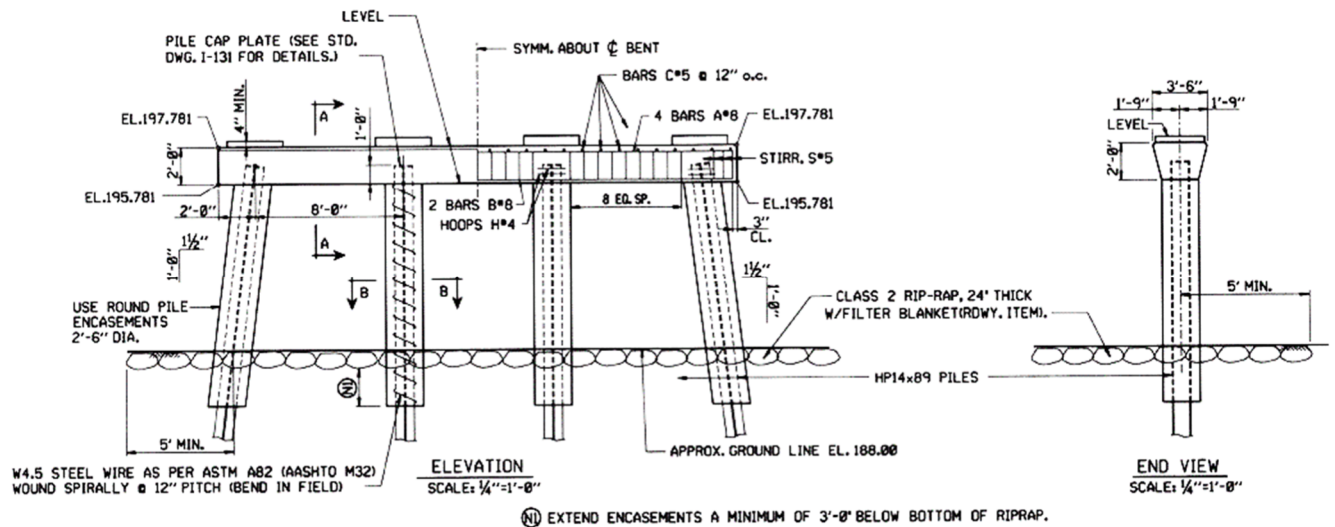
Construction Drawings of Macon County Road 9 Test Bent
